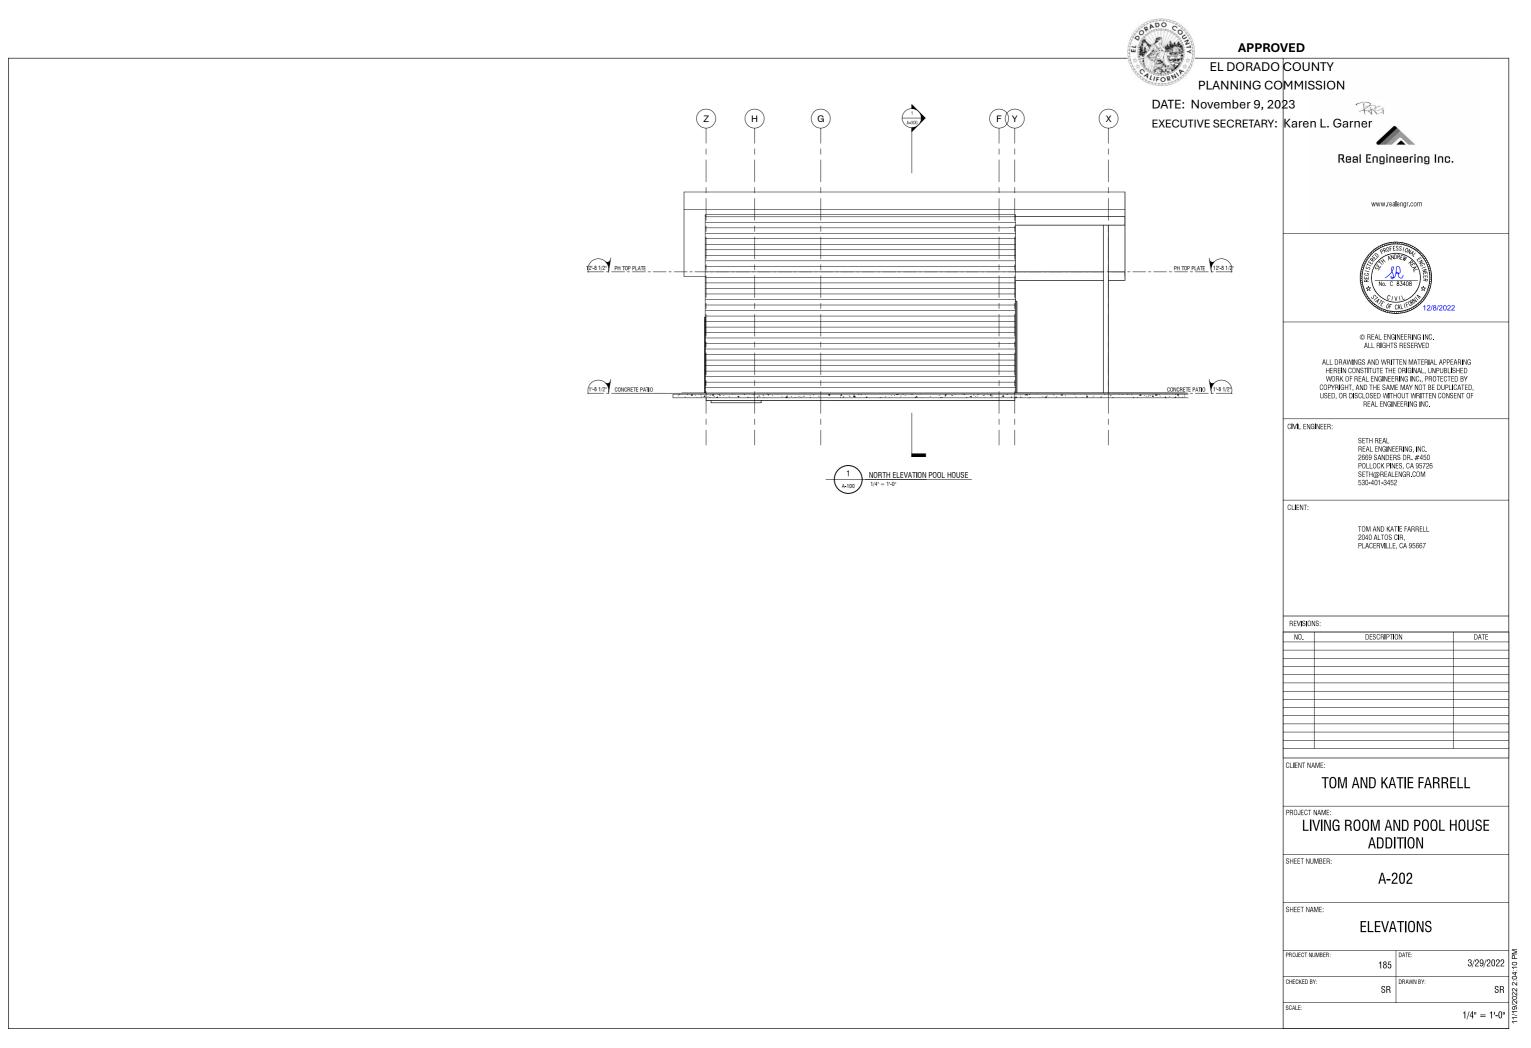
Exhibit E: Project Plan Sheets CUP22-0015/Farrell Nonconforming Use (New Build)
